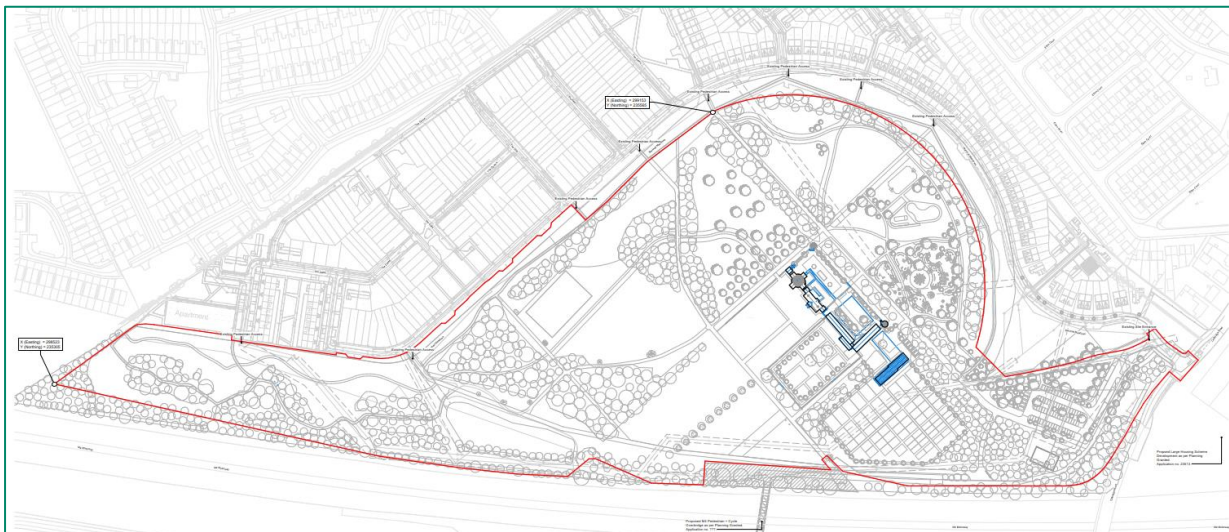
Proposed Site Layout Plan (Source: Networks Drawing No. 081002)
